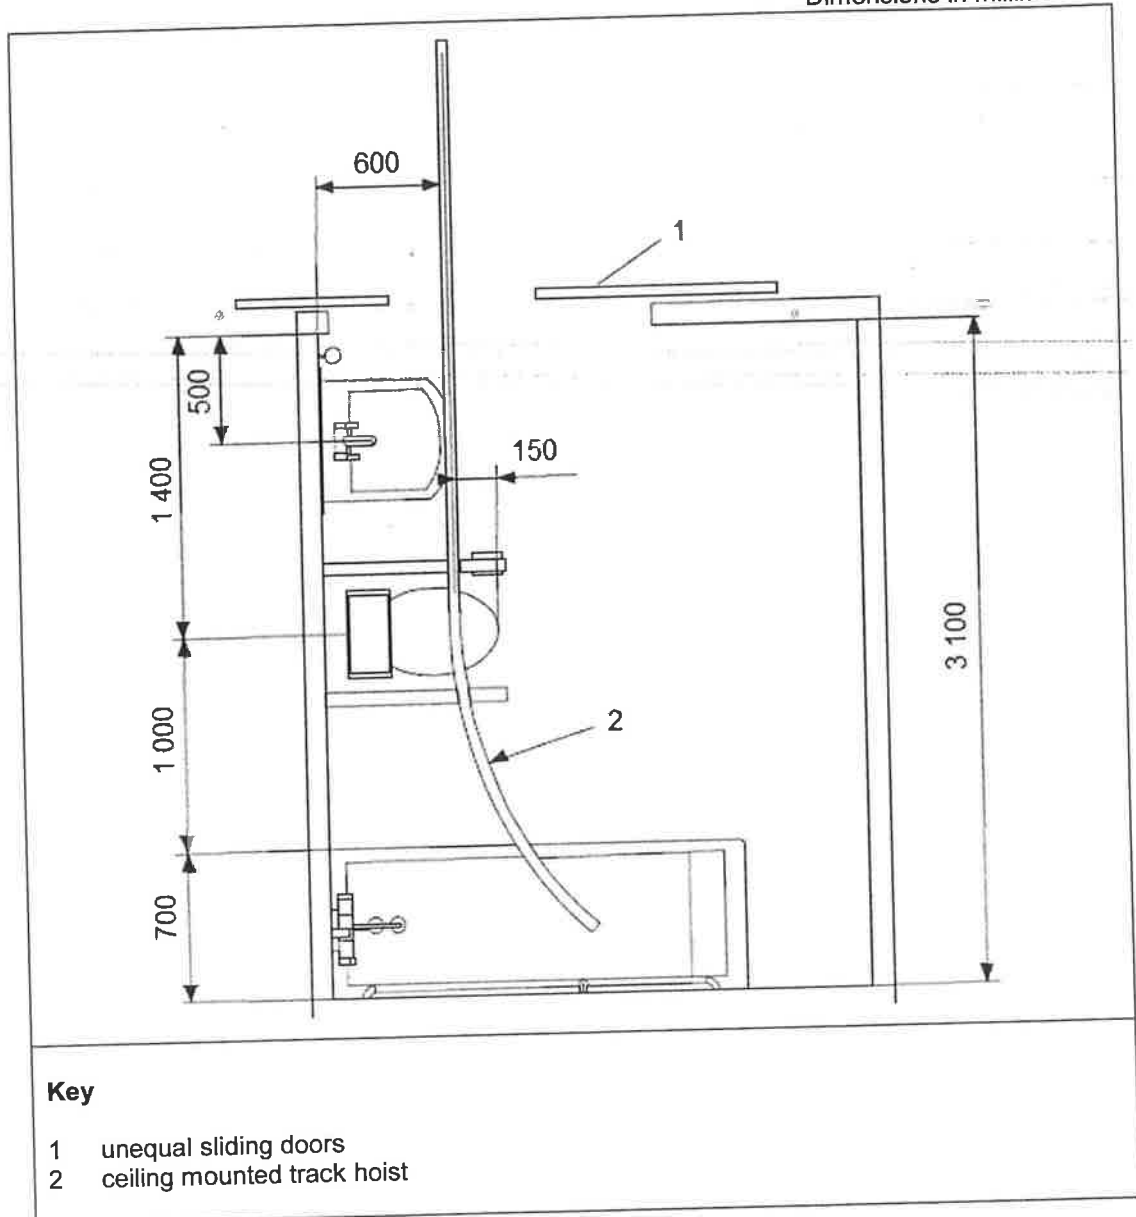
Example of a bathroom with a ceiling mounted tracked hoist for independent or assisted use
